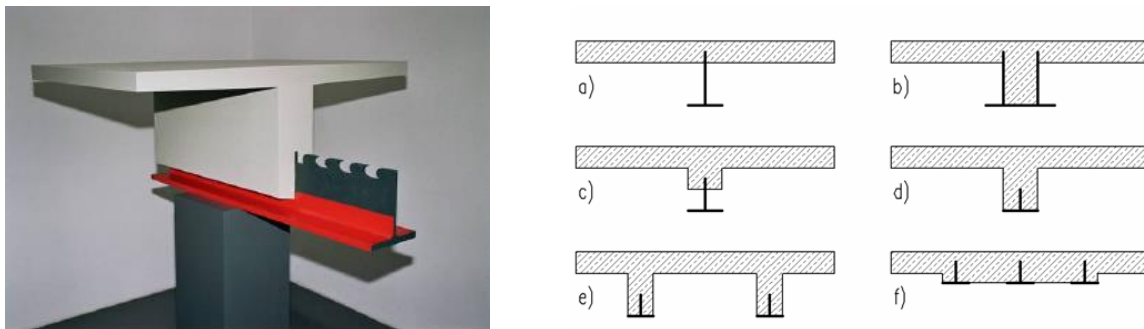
Precobeam girder. Configuration variants of PRECO girders for bridge construction
